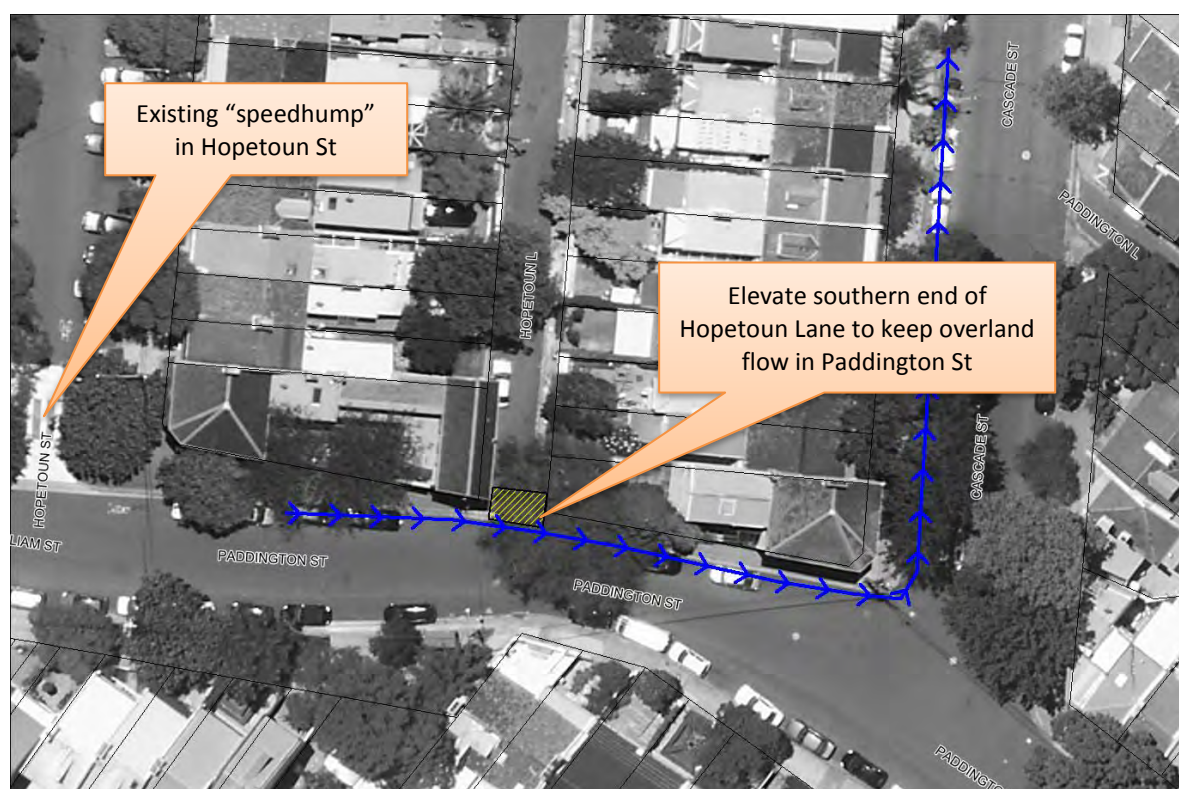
Design Concept for Hopetoun Lane / Paddington Street Regrading
